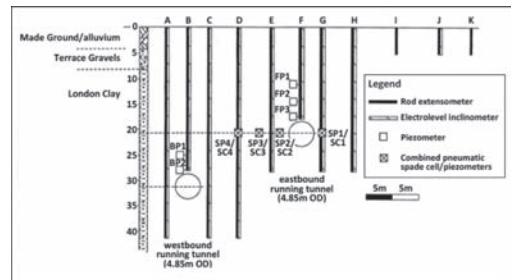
Layout of instrumentation at St. James's Park. (after Nyren, 1998).
